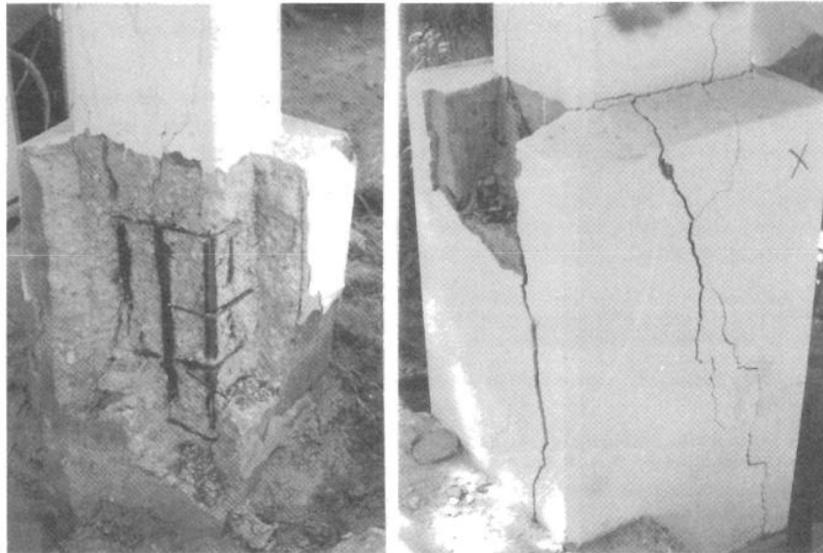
damaged concrete column showing large spalls and cracking
